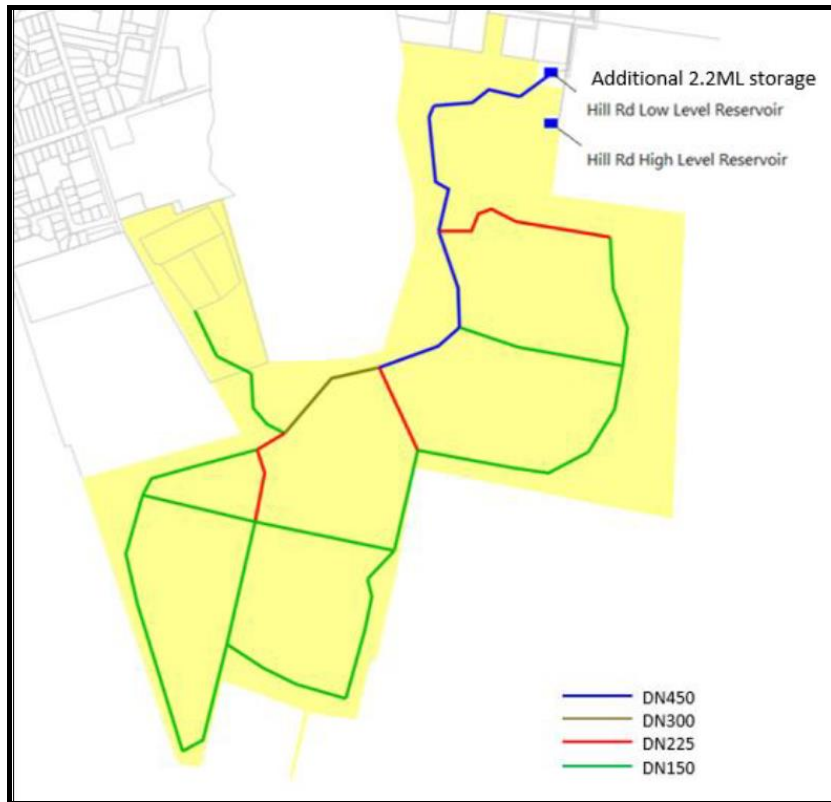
Proposed Water Supply for the Concept Plan (Source: UWS, August 2020, Figure 4-1)
